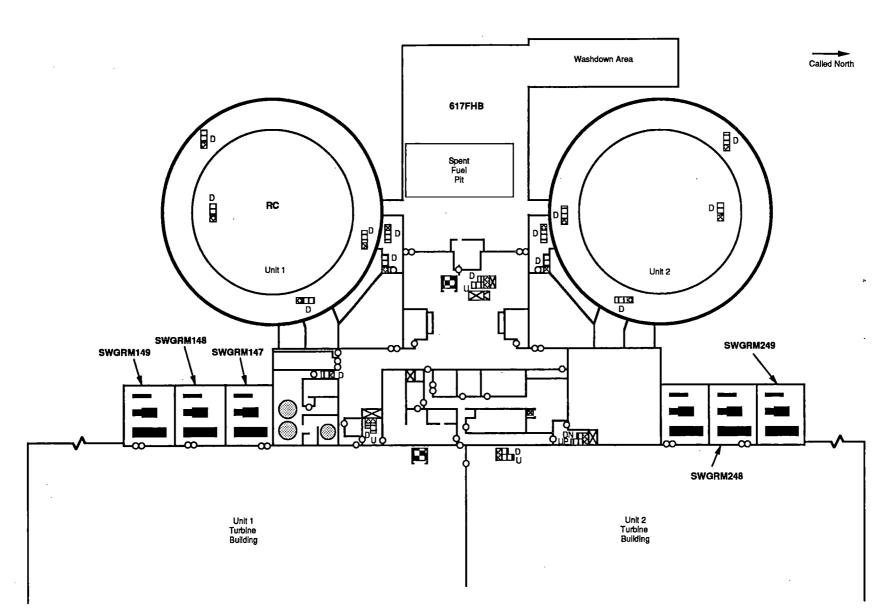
Zion 1 and 2 General Arrangement, Elevation 617'
